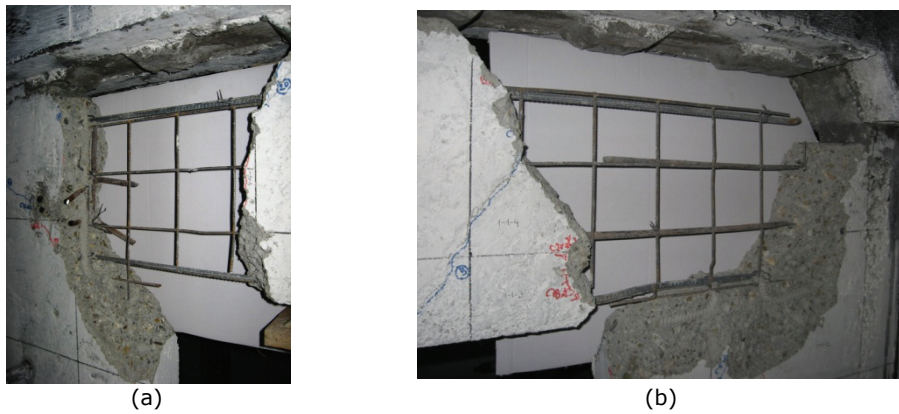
Failure detail PRCWP 5-S/E3-T: spandrel-to-pier connections after the crushed concrete was removed (close-up on observation grid 4-4 and 1-1)
